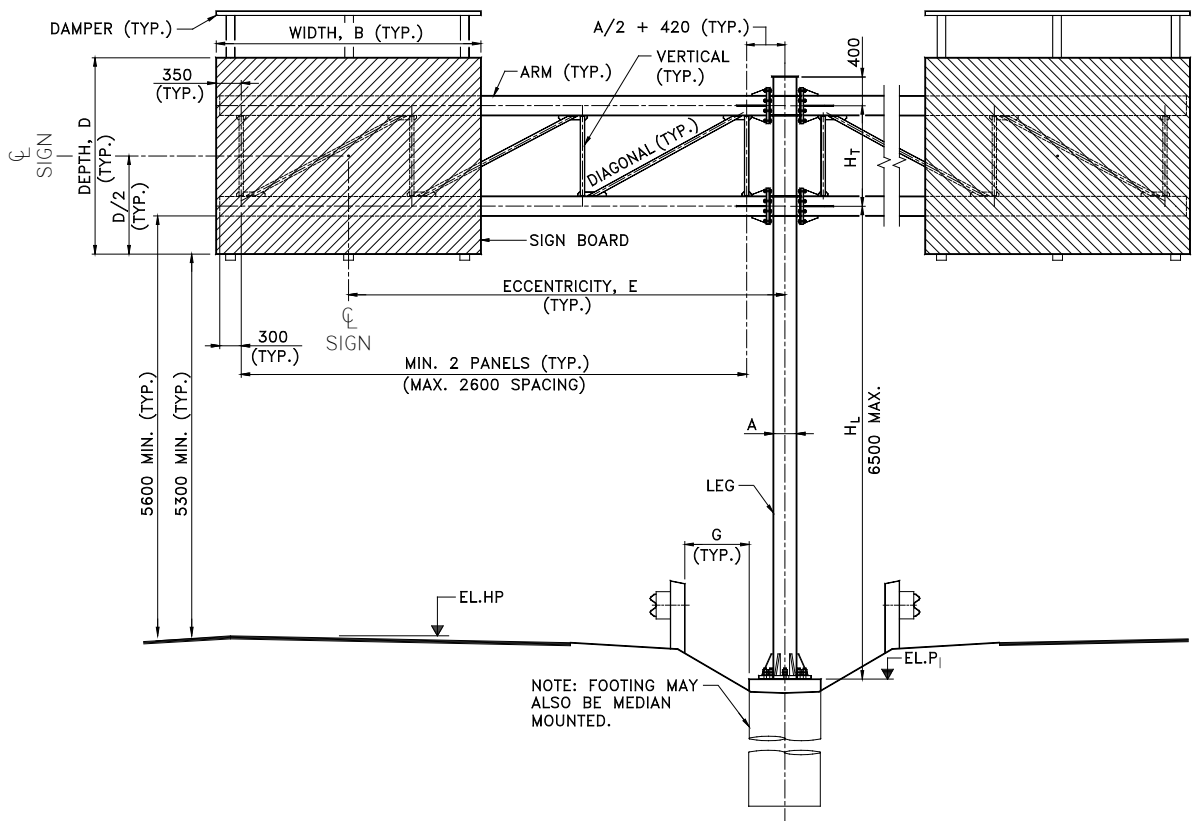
(d) TYPICAL BUTTERFLY CANTILEVER SIGN SUPPORT ELEVATION
